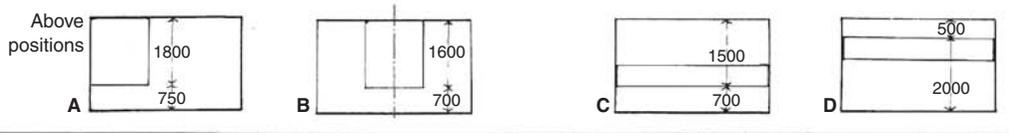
A study of daylight distribution. Column A: jamb fixed at side wall, width variable, Column B: centre of window on room centreline, width variable, Column C: full width, sill fixed, height variable, Column D: full width, window head fixed, height variable. Each variant is examined with sizes of 10–50% of wall area (after T. Yamaguchi).
